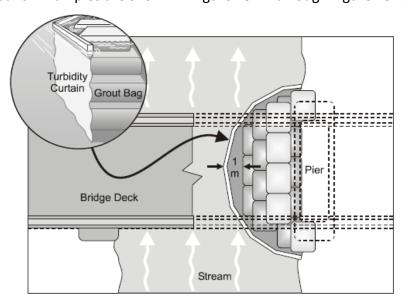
Grout Bags used for Local Scour Armoring (Riprap Substitution)
